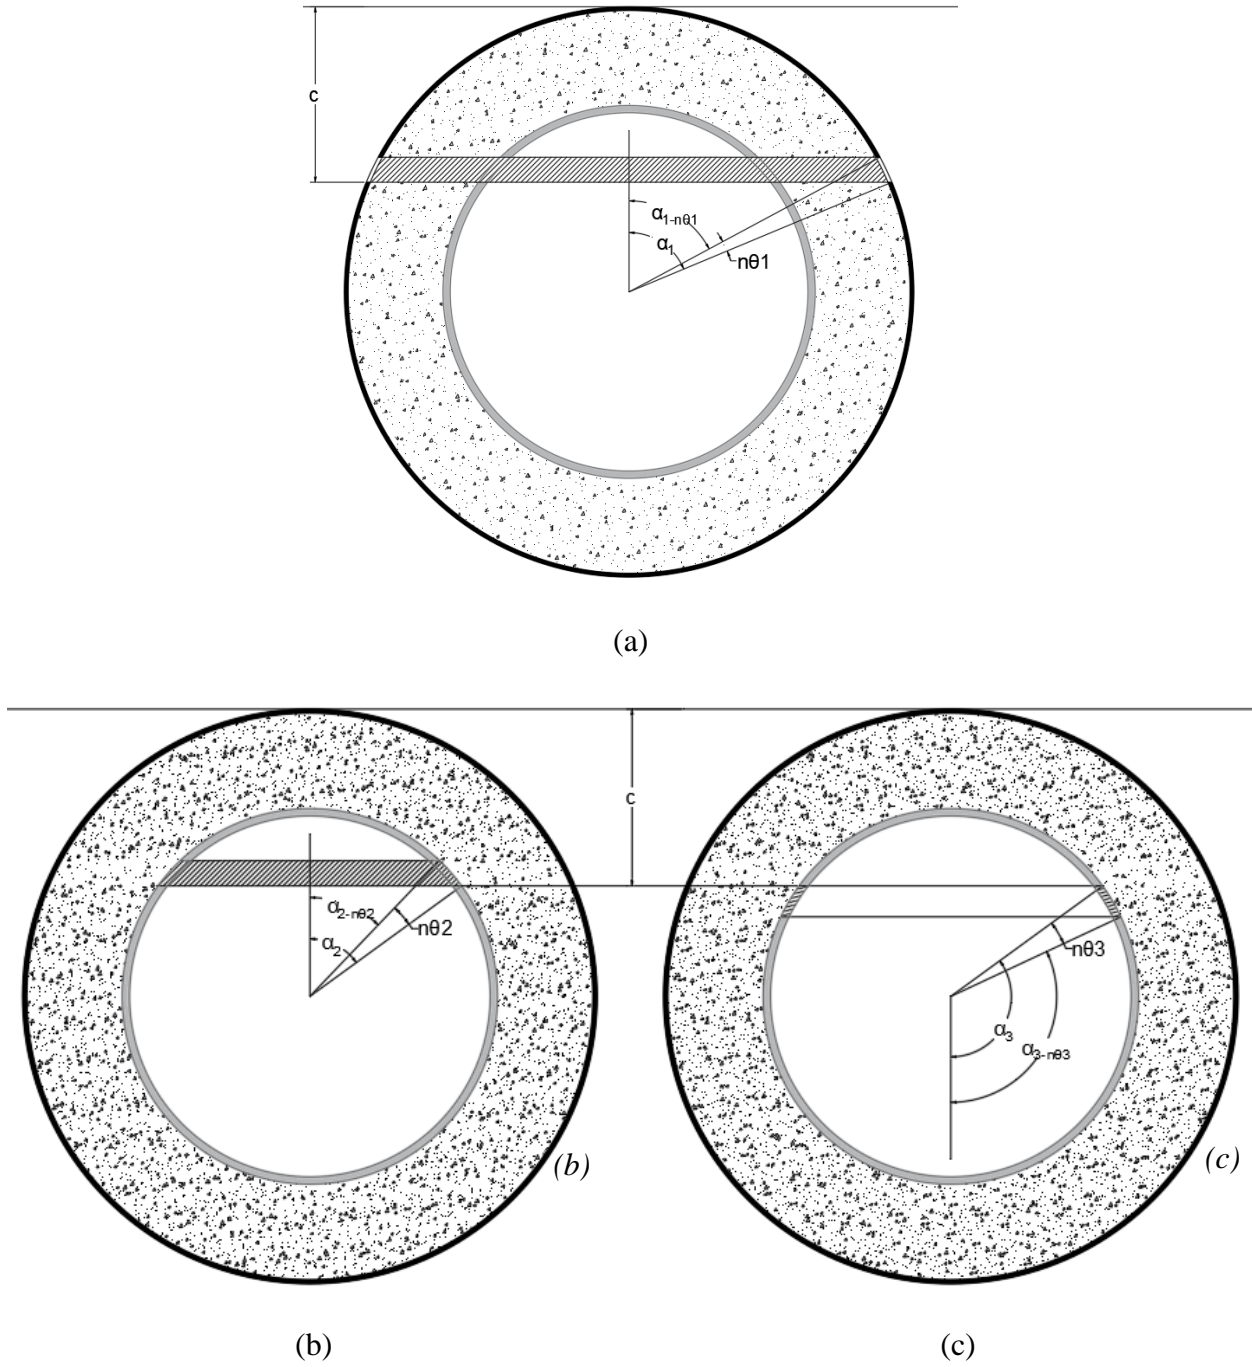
Cross-section of the column for a segment to calculate compressive and tension forces in (a) assumed solid concrete in compression, (b) virtual concrete and steel in compression, and (c) steel in tension
